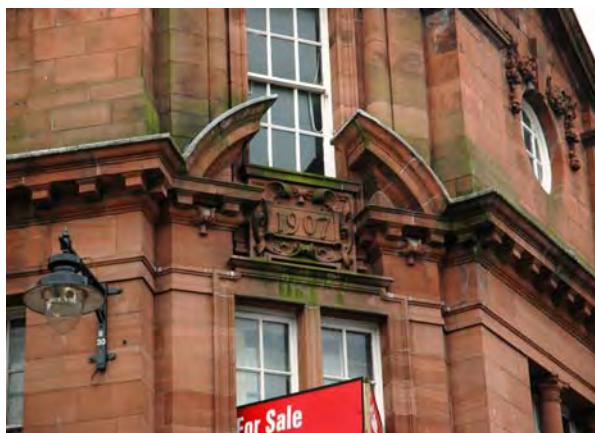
Organic soiling of masonry adjacent to prominent and horizontal masonry surfaces where water has accumulated. Note that the upper surface of the cornice has lead flashing which prevents water penetration and protects the underlying stone (K18; 73 John Finnie Street).
